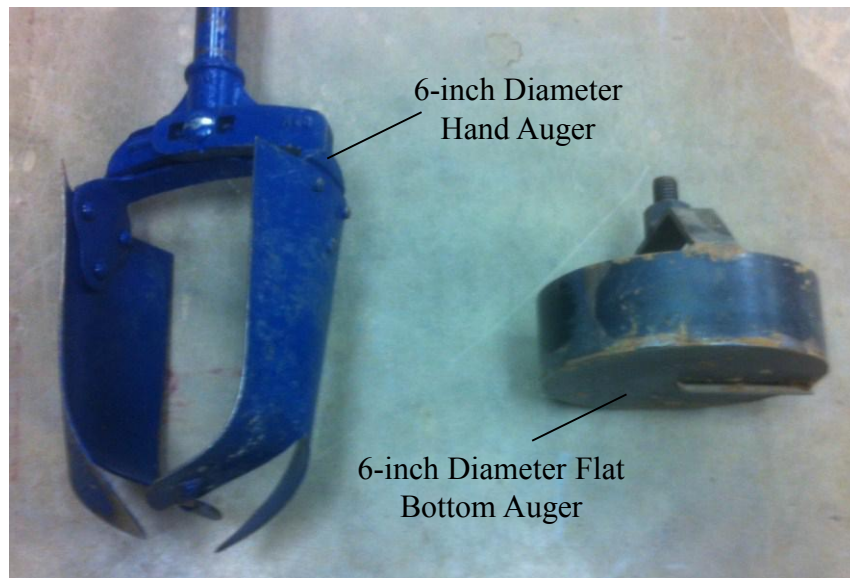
Augers used for Stage 1 borehole excavation for TSB testing.
